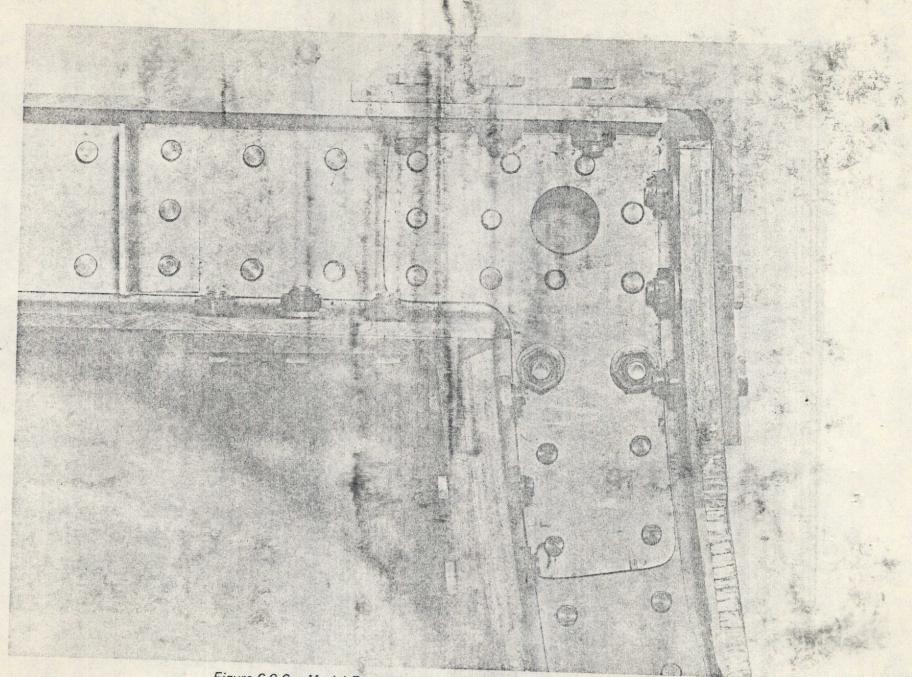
Model Frame Corner Detail—Stiffener Side
